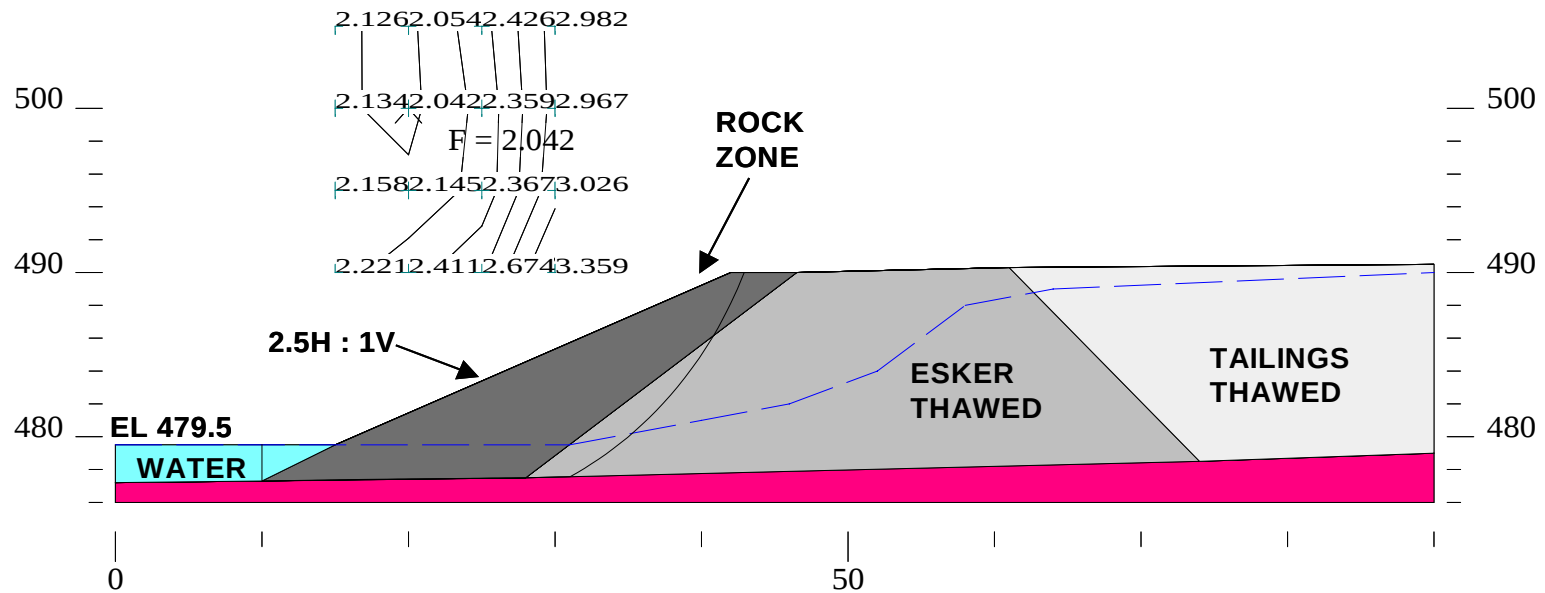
3 Dam. rock zone graded to 2.5h : 1v slope
